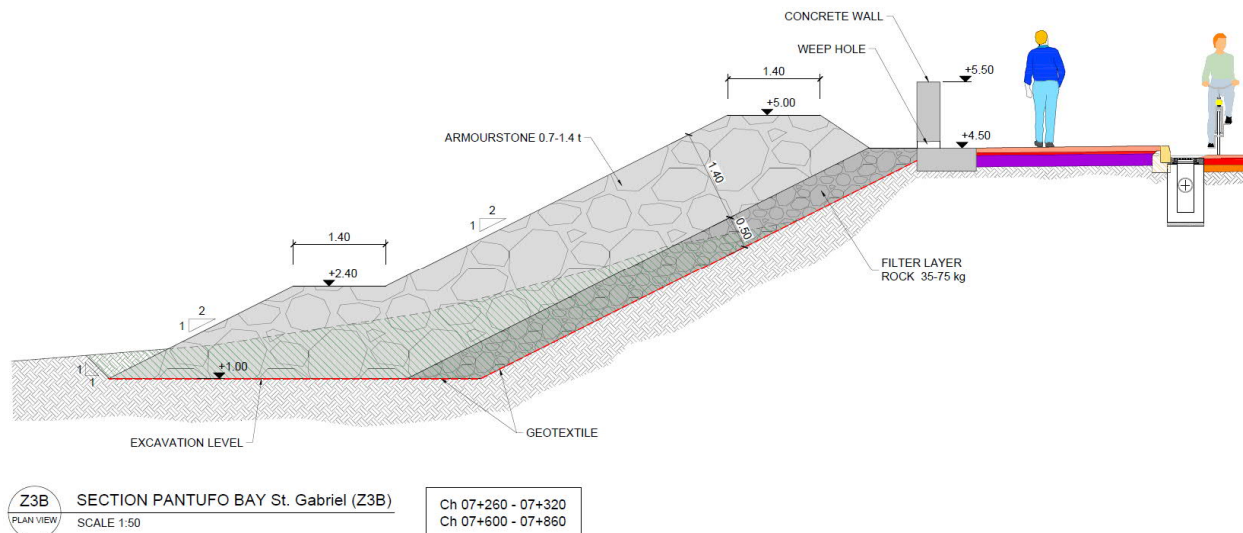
Typical cross section. Pantufo Coastline (CH 7+260 – CH 7+300; CH 7+600-CH 7+860)
